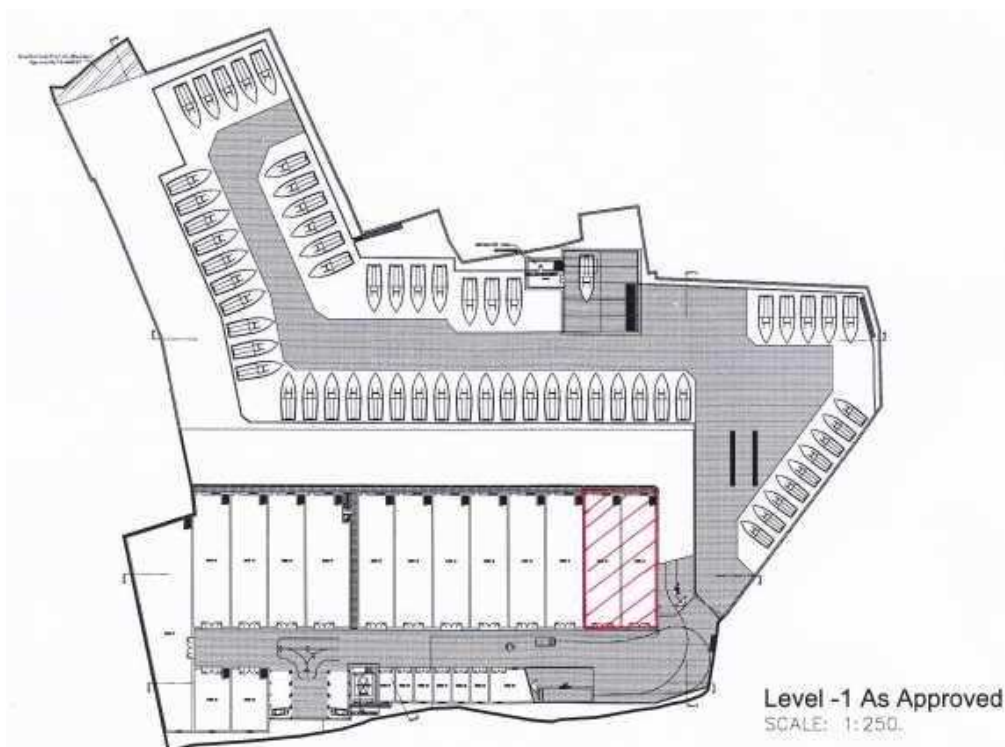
Site of permitted installation, showing extent of area delineated in red
